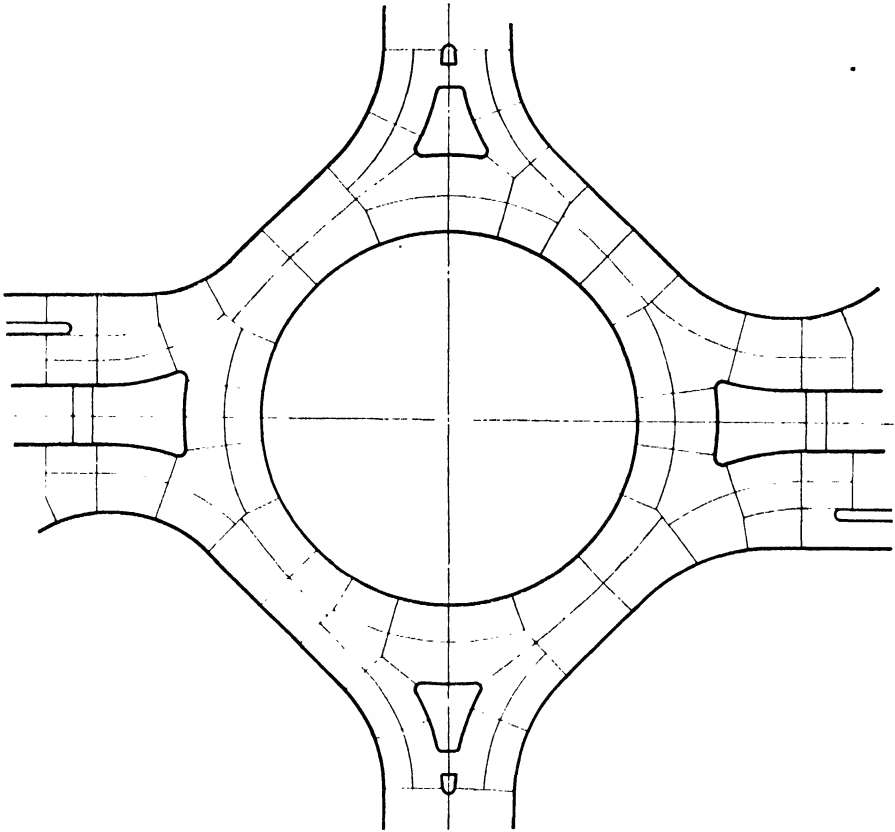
ARRANGEMENT OF CONCRETING OF ROUNDABOUT AT JUNCTION OF THE HORSHAM ROAD AND THE CRAWLEY BY-PASS ROAD.
